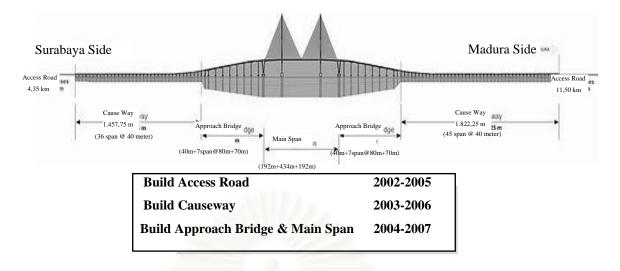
Longitudinal section of Suramadu Bridge (booklet of Suramadu Bridge Project, 2005)
